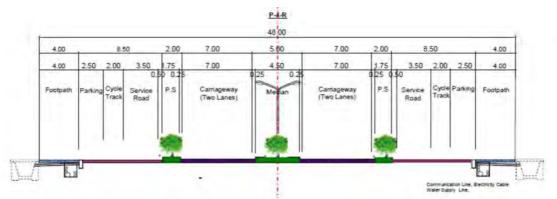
Proposed Typical Cross Section (Primary-Residential-4 Lanes)
